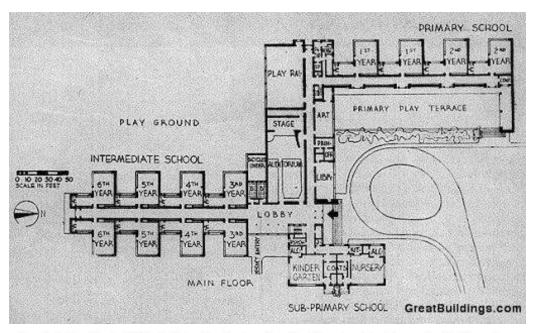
Perkins, Wheeler & Will with Eliel and Eero Saarinen, Crow Island Elementary School. Source: Great Buildings - Crow Island Elementary School floor plan, 1940 (Anon., 2016)
